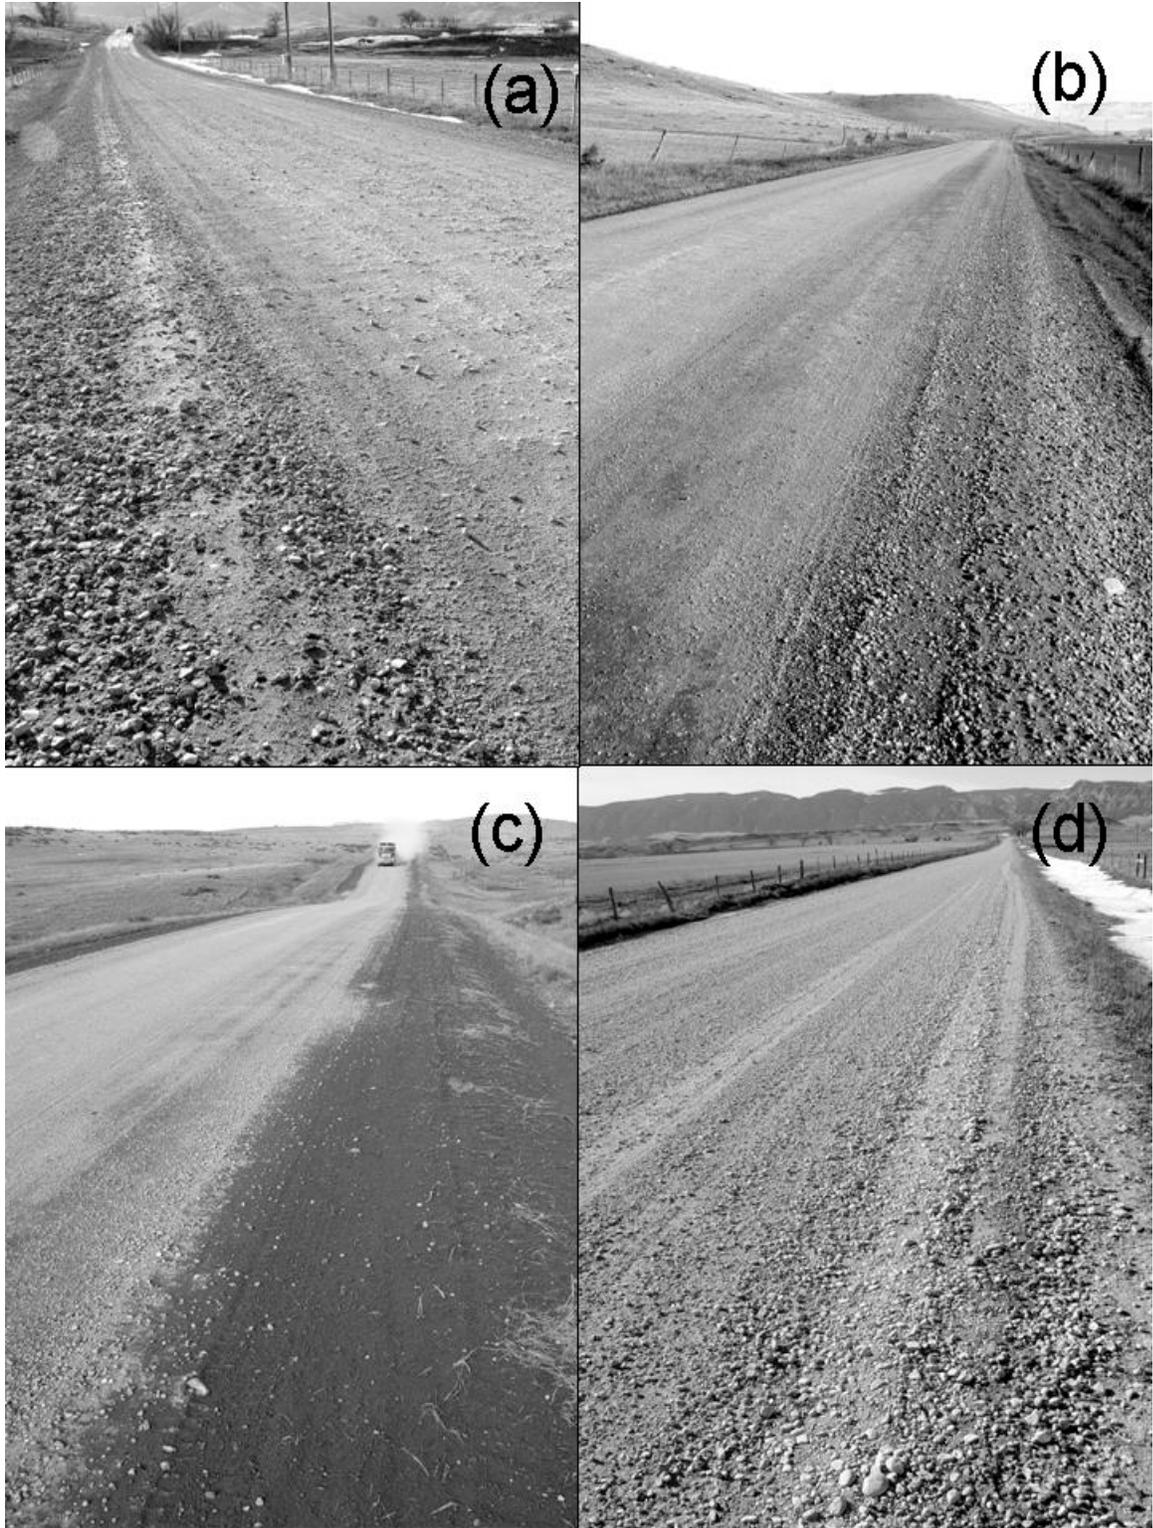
Study sections: (a) Wagonbox Road; (b) Lower Prairie Dog Road; (c) Passaic Road; and (d) Crazy Woman Canyon Road.
